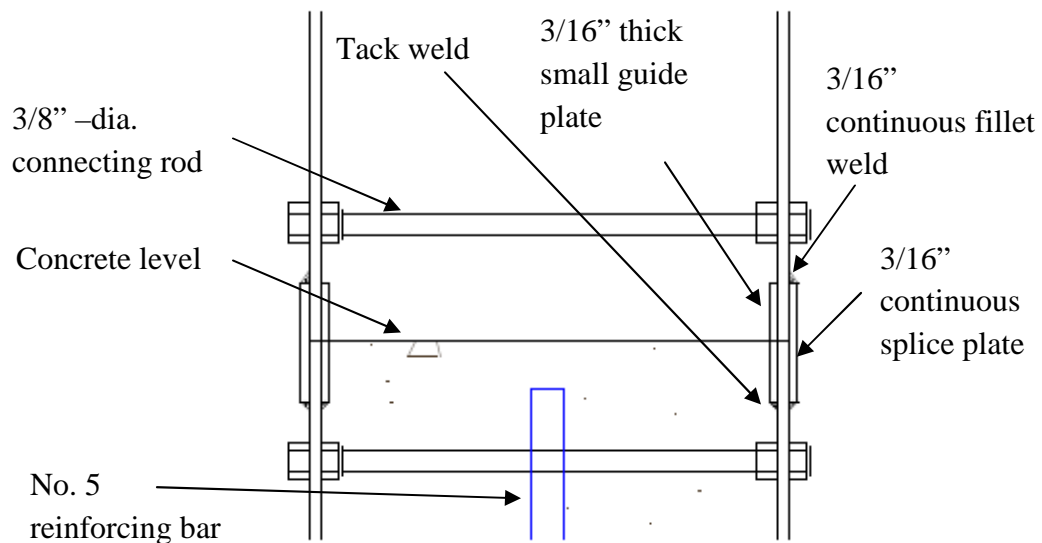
Connection of adjacent wall plate assemblies using horizontal splice plates
